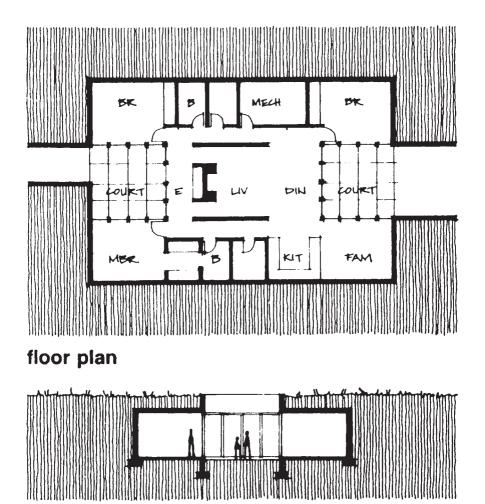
Atrium plan and section. (McGraw-Hill, Inc.)
